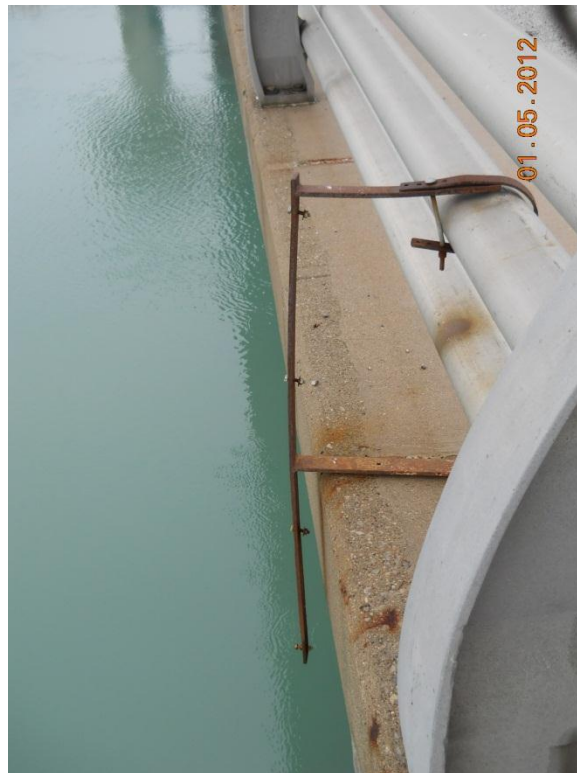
North sidewalk, east end of span 2 - Note spall with exposed corroded reinforcing steel bar.
